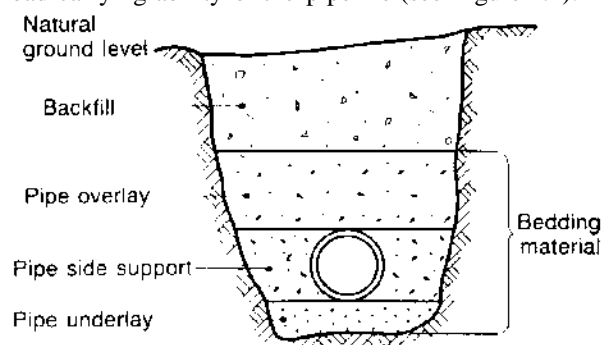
LAYERS IN A TRENCH INSTALLATION
